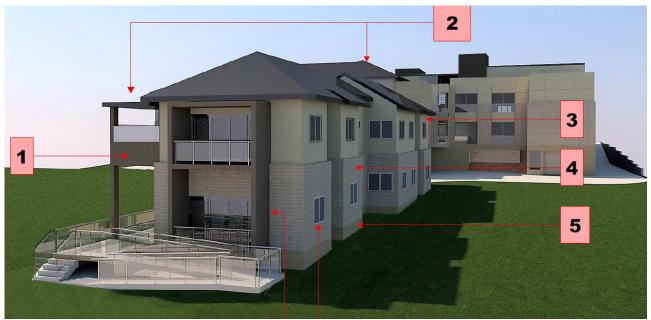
Photomontage of the proposed Beresford Road building (view from Beresford Road)
